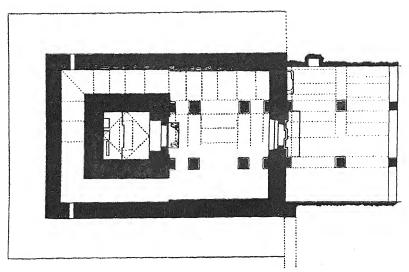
PLAN, SUN TEMPLE, SUTRAPADA
